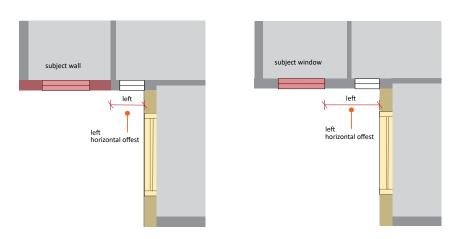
Horizontal offset wing wall measurement relative to subject wall or window
